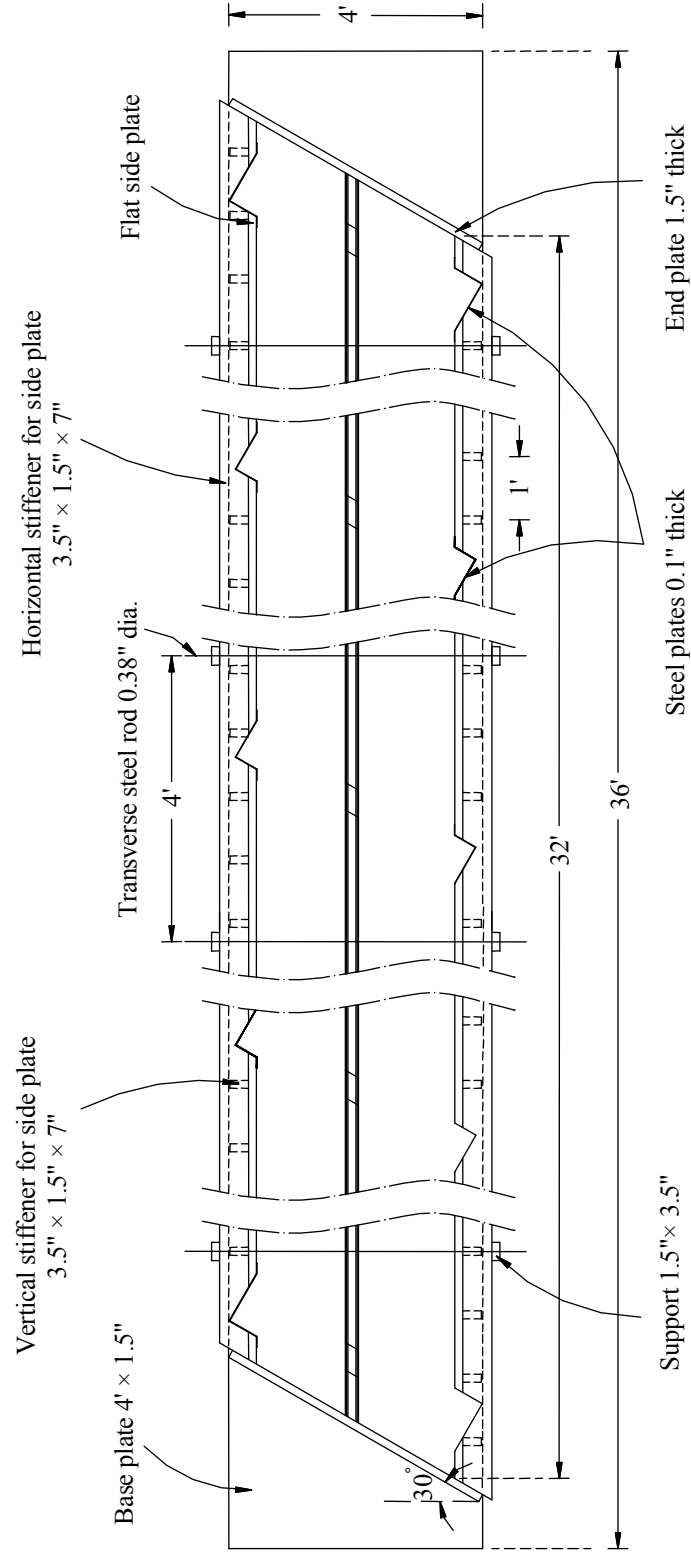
Plan view of the formwork for box-beams with projected side plates.
